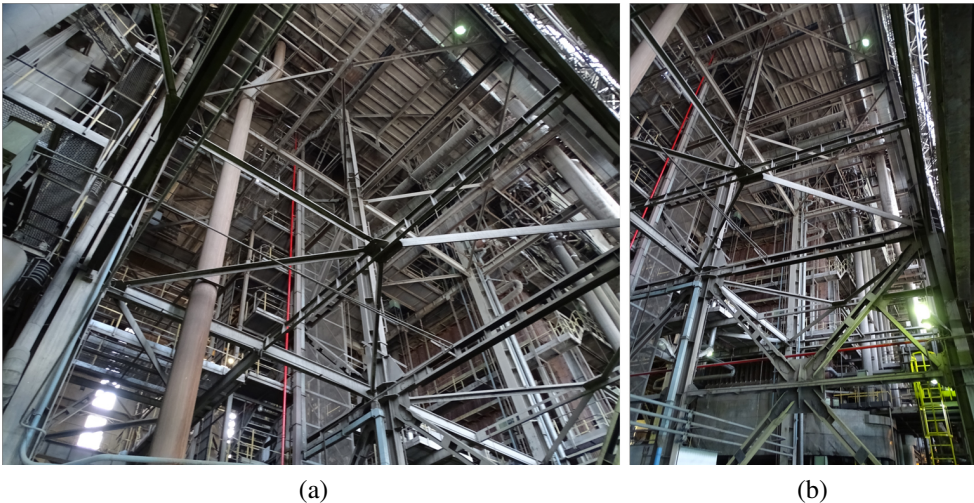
Photos of steel structure at +25.5 m: a) Horizontal bracing on level 34.0, b) Vertical bracing in axes 12
